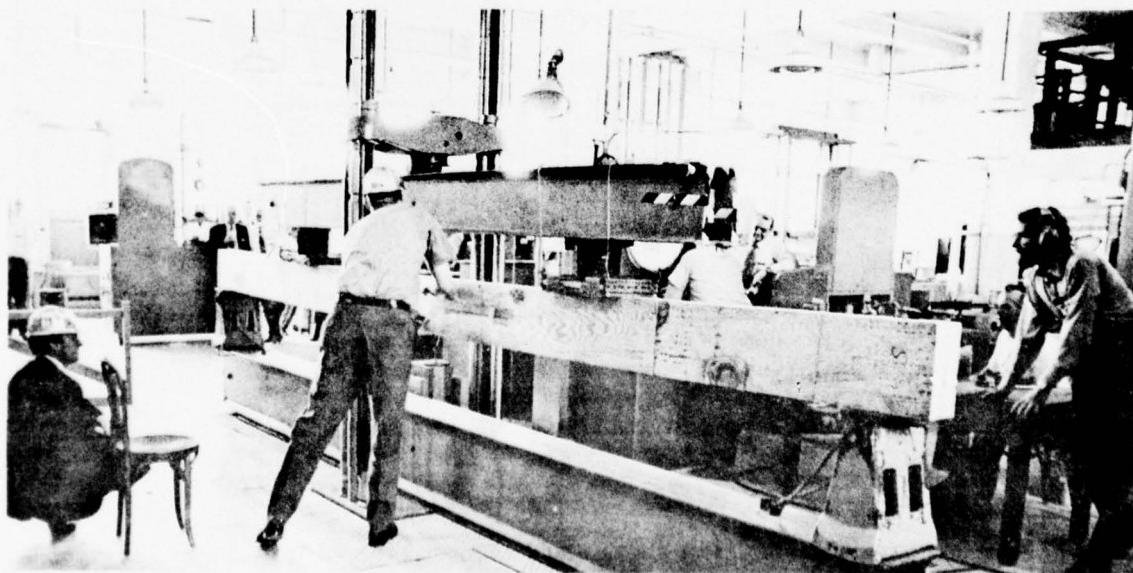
Test of Press-Lam bridge stringer. (M 140 153-5)
